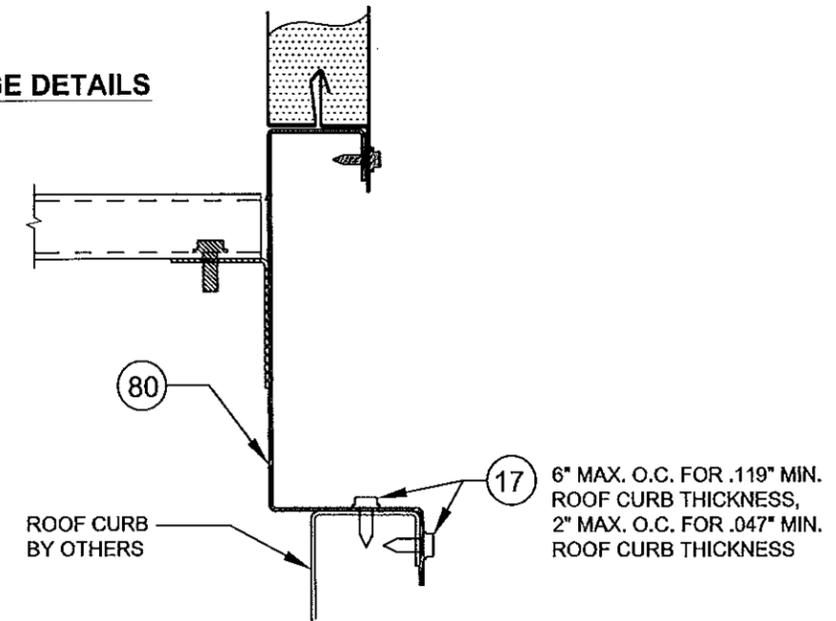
DETAIL B. TYPICAL INSTALLATION BASE RAIL TO CURB
